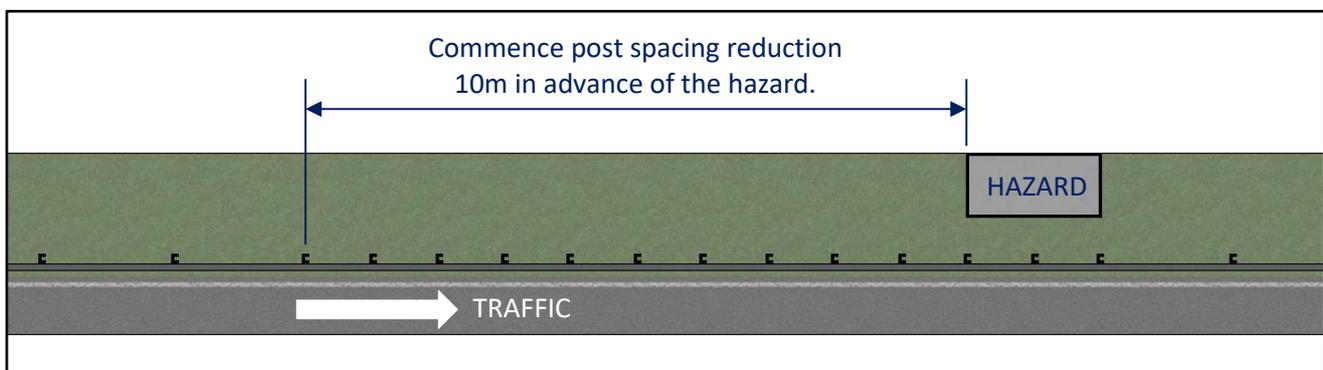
RamShield® W-Beam, Reduced Post Spacing
